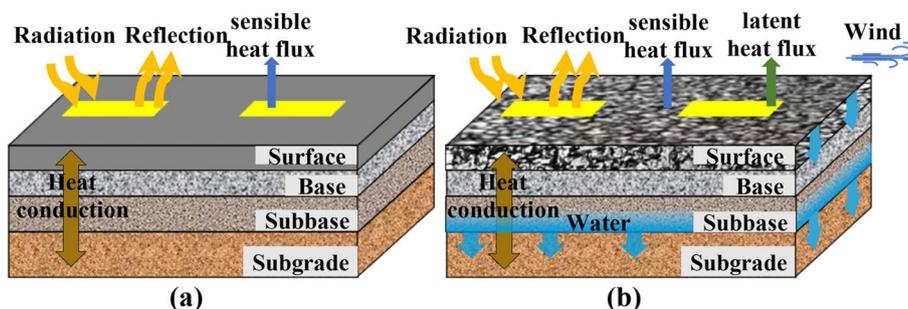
a Conventional pavement, b Permeable pavement [91]
